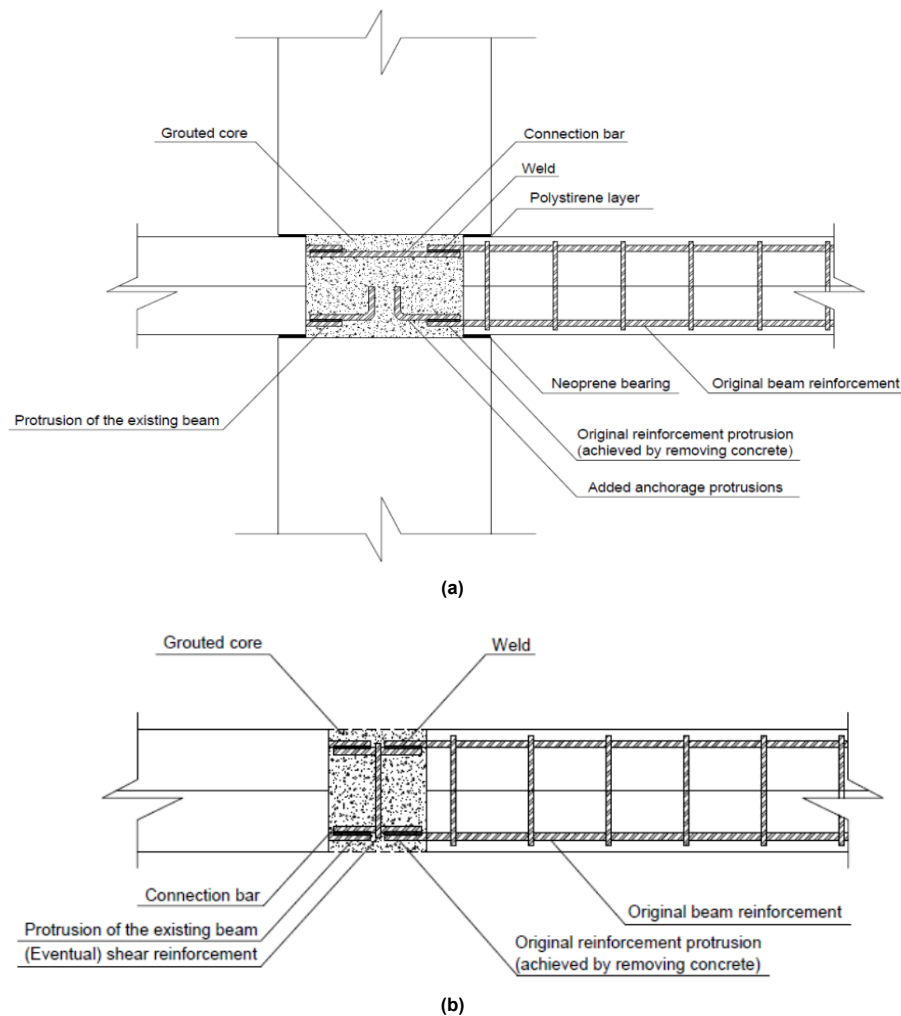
Design proposal for reconnecting reused beams (Volkov, 2019)
